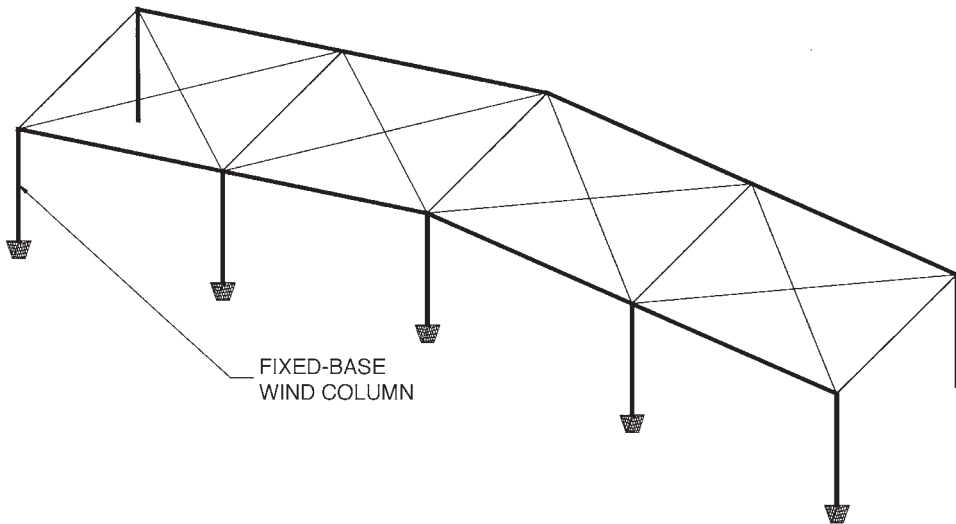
Fixed-based endwall columns. One manufacturer recommends that this bracing option be used only if all of the following conditions are met: The eave height ≤ 18 ft; the width ≤ 160 ft; the roof slope $\leq 1:12$. (*Nucor Building Systems.*)
